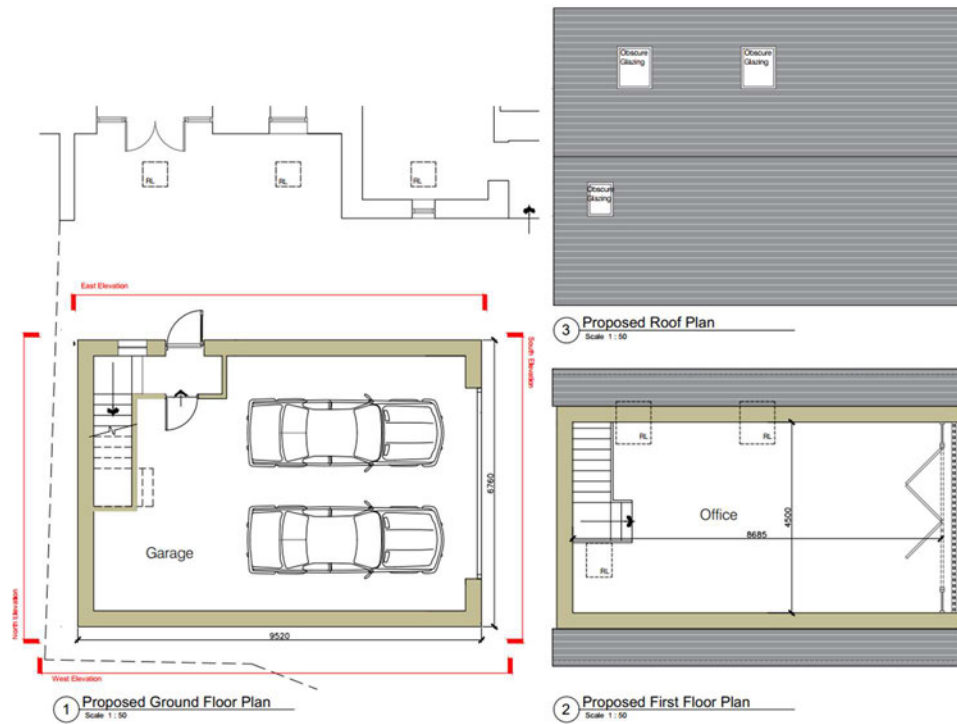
Drawing Ref no. P.03-ZZ-002 - layout of proposed development
